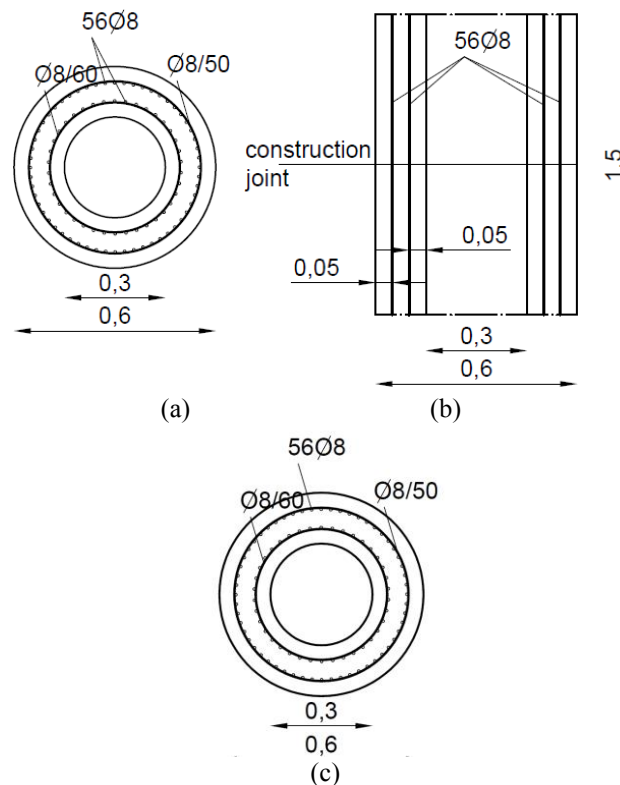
a) Specimen 1- cross section, b) Specimen 1- elevation b) Specimen 3-cross section
